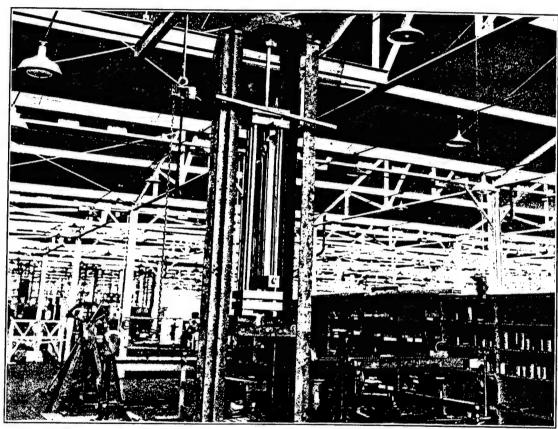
Compression Test Set-up with Long Screws in Jig.
